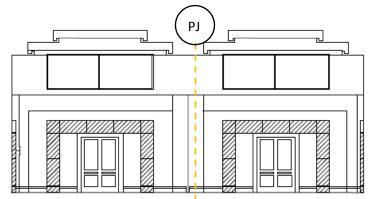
East Elevation of Ballroom | Proposed Location of Clerestories
